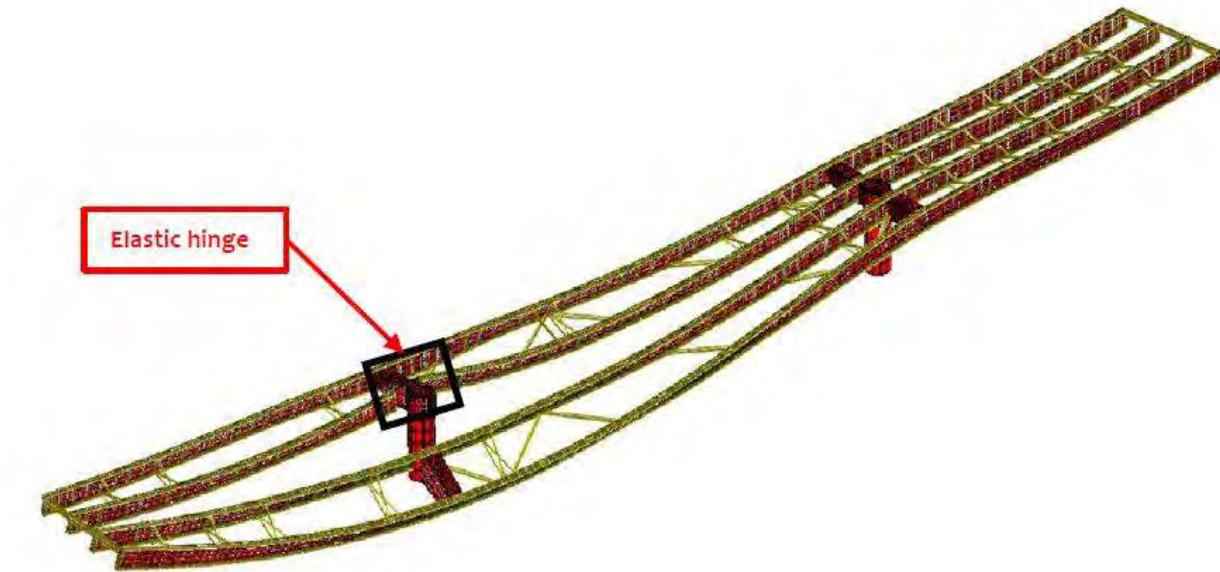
Framing plan after forming elastic hinge in girder B at pier 1 at  $0.03 \times HL-93$  (Deck not shown for clarity)
